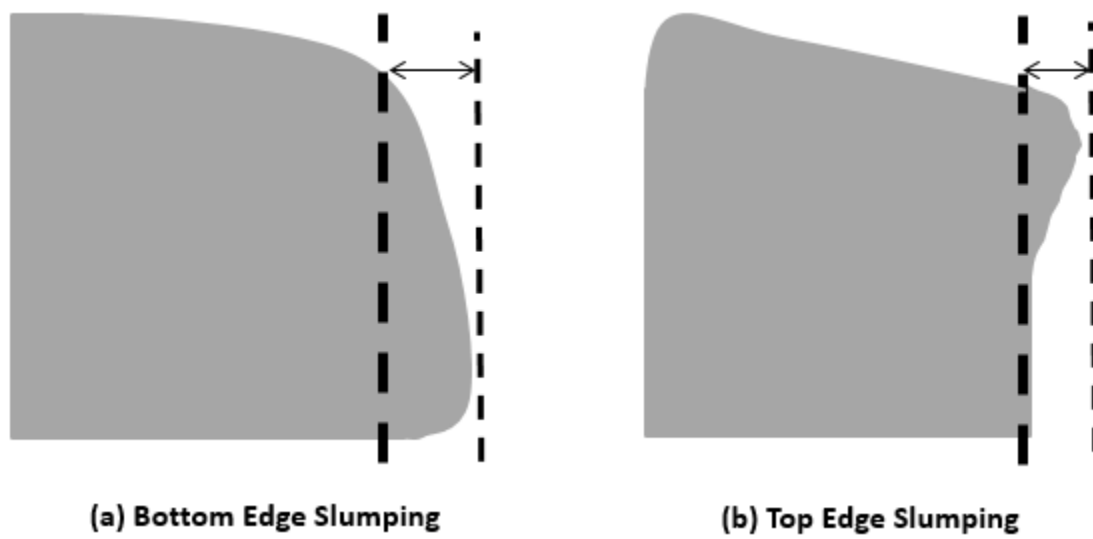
Edge Slump Measurement illustrated for (a) Bottom Edge Slumping and (b) Top Edge slumping.
